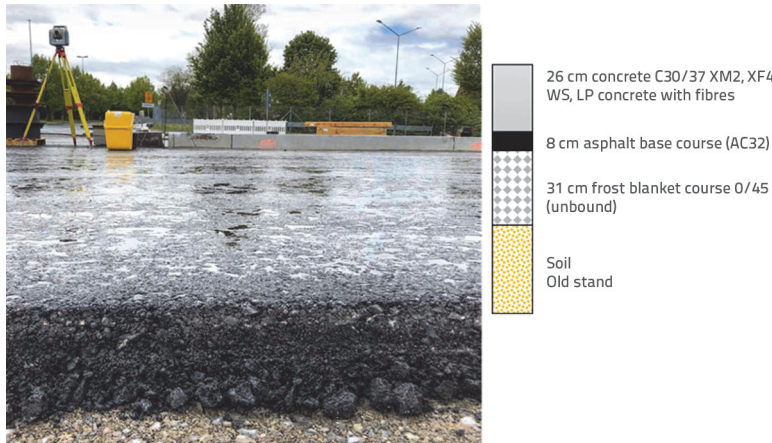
Concrete construction junction: asphalt base course, total superstructure cross section, Daimler junction [3] (edited by author)
